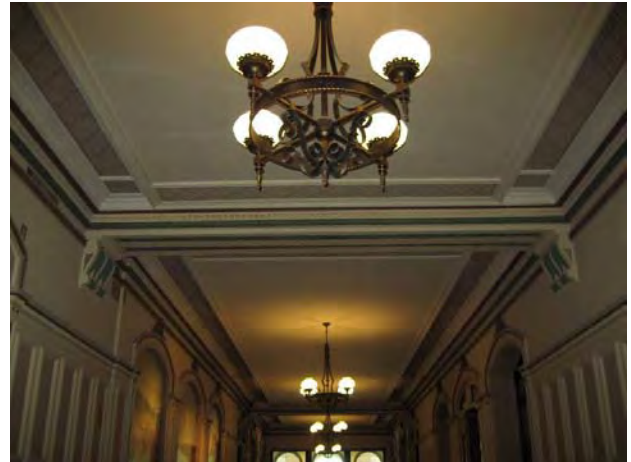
Wrought iron beams spanning the width of the main corridors on first floor, supported on cast iron brackets.
